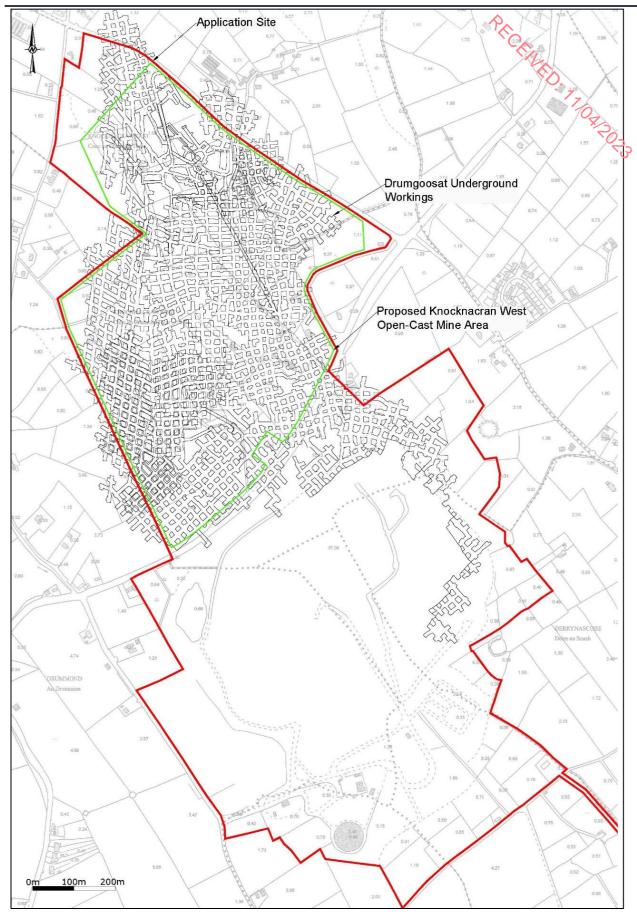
Plan showing extent of the former Drumgoosat Mine underground workings
